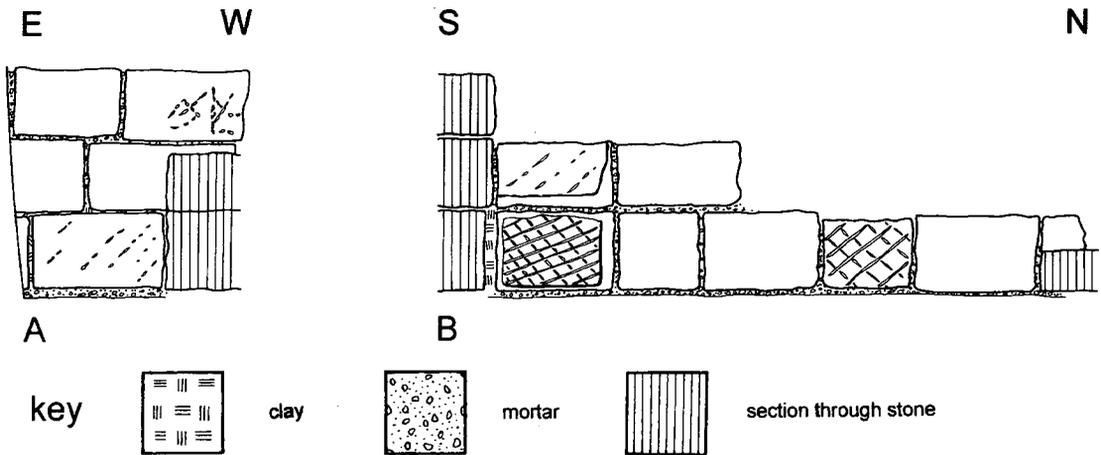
Elevations of the surviving walls of the *principia* strong room. A: the south wall. B: the west wall. Scale 1:40.
